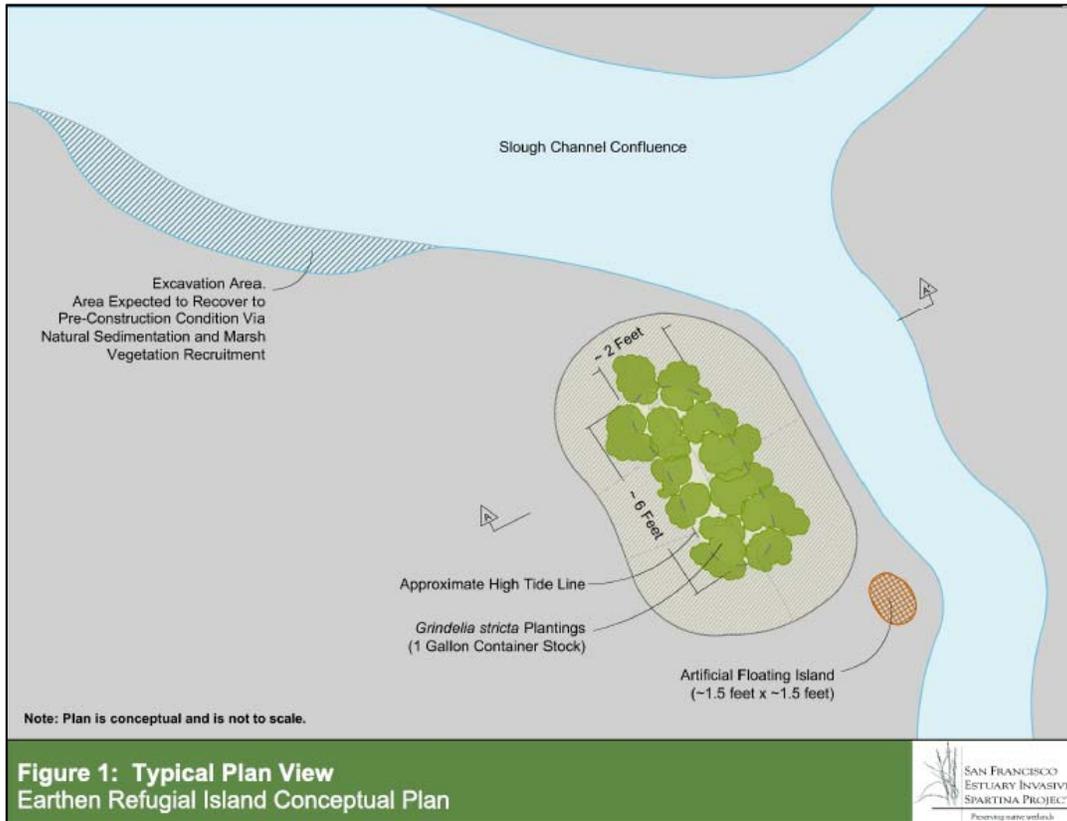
Typical Plan View Earthen Refugial Island Conceptual Plan
